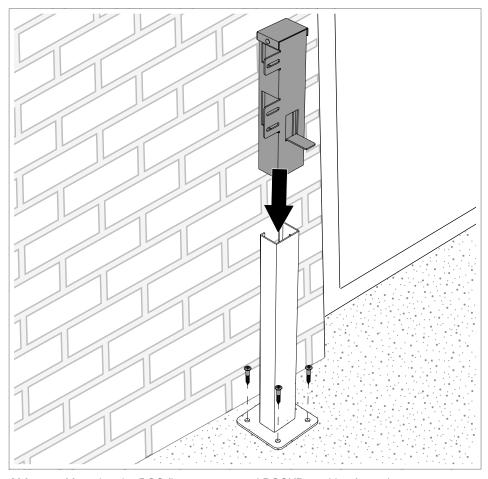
Mounting the BOS floor support and BOSKB trunking fastening
